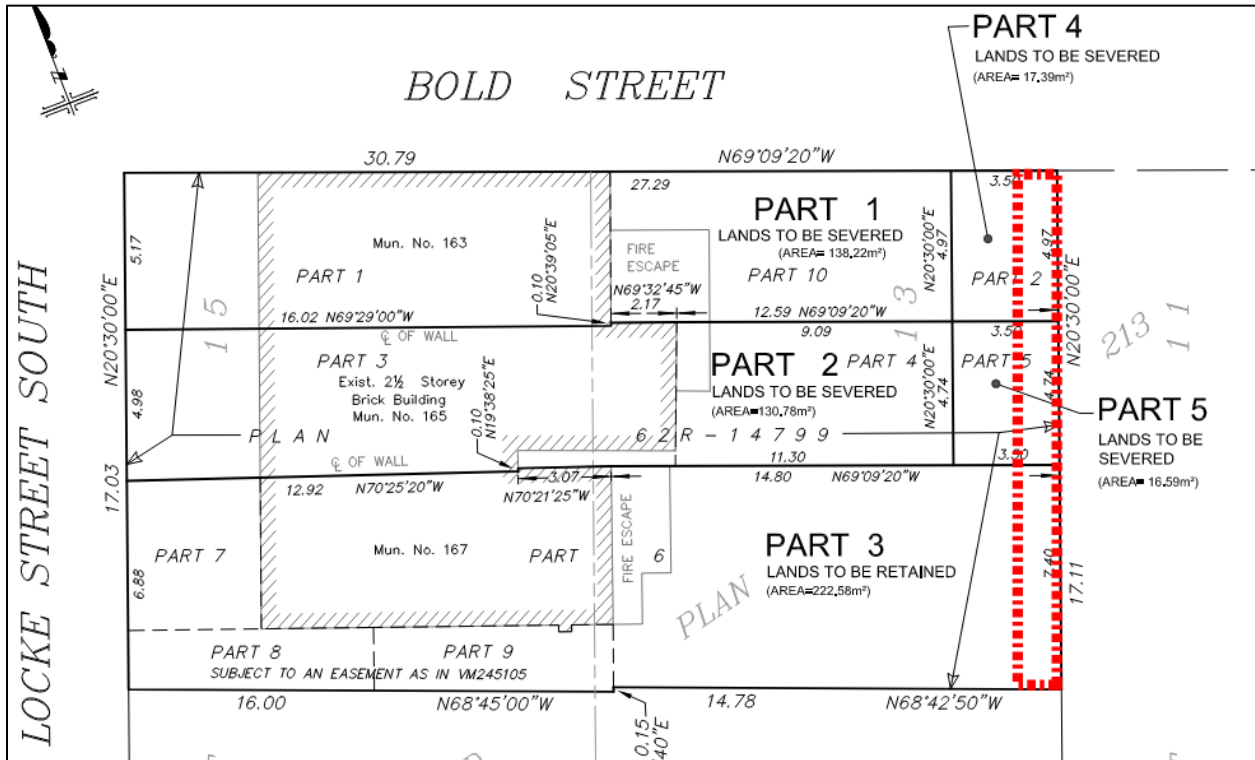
Location of Planting Strip Required by Section 10.5a.3 i) of Zoning By-law 05-200
